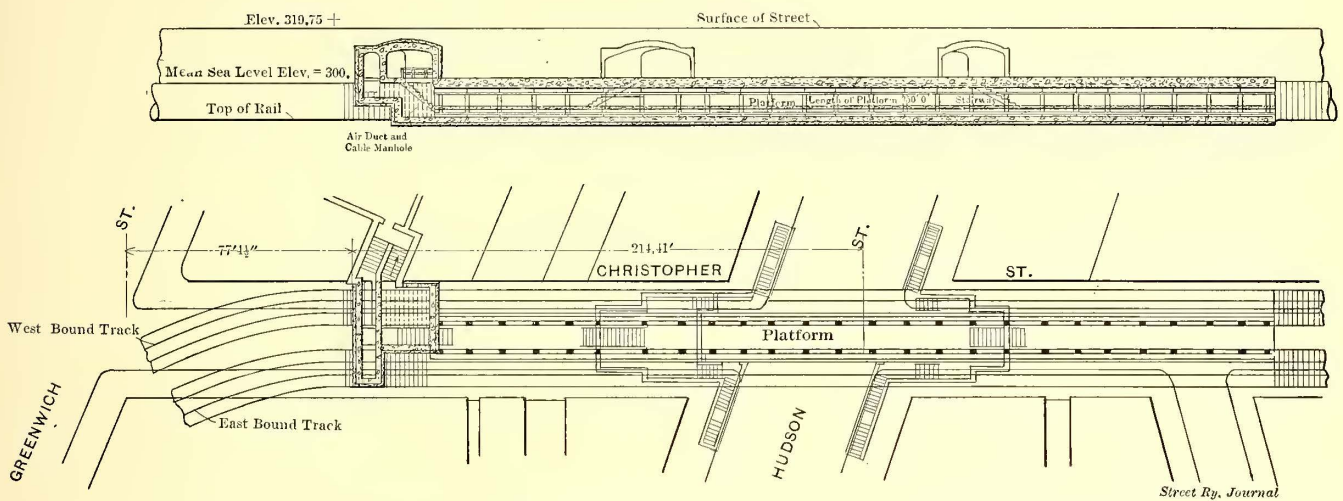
PLAN AND LONGITUDINAL SECTION OF THE HUDSON STREET STATION, NEW YORK
